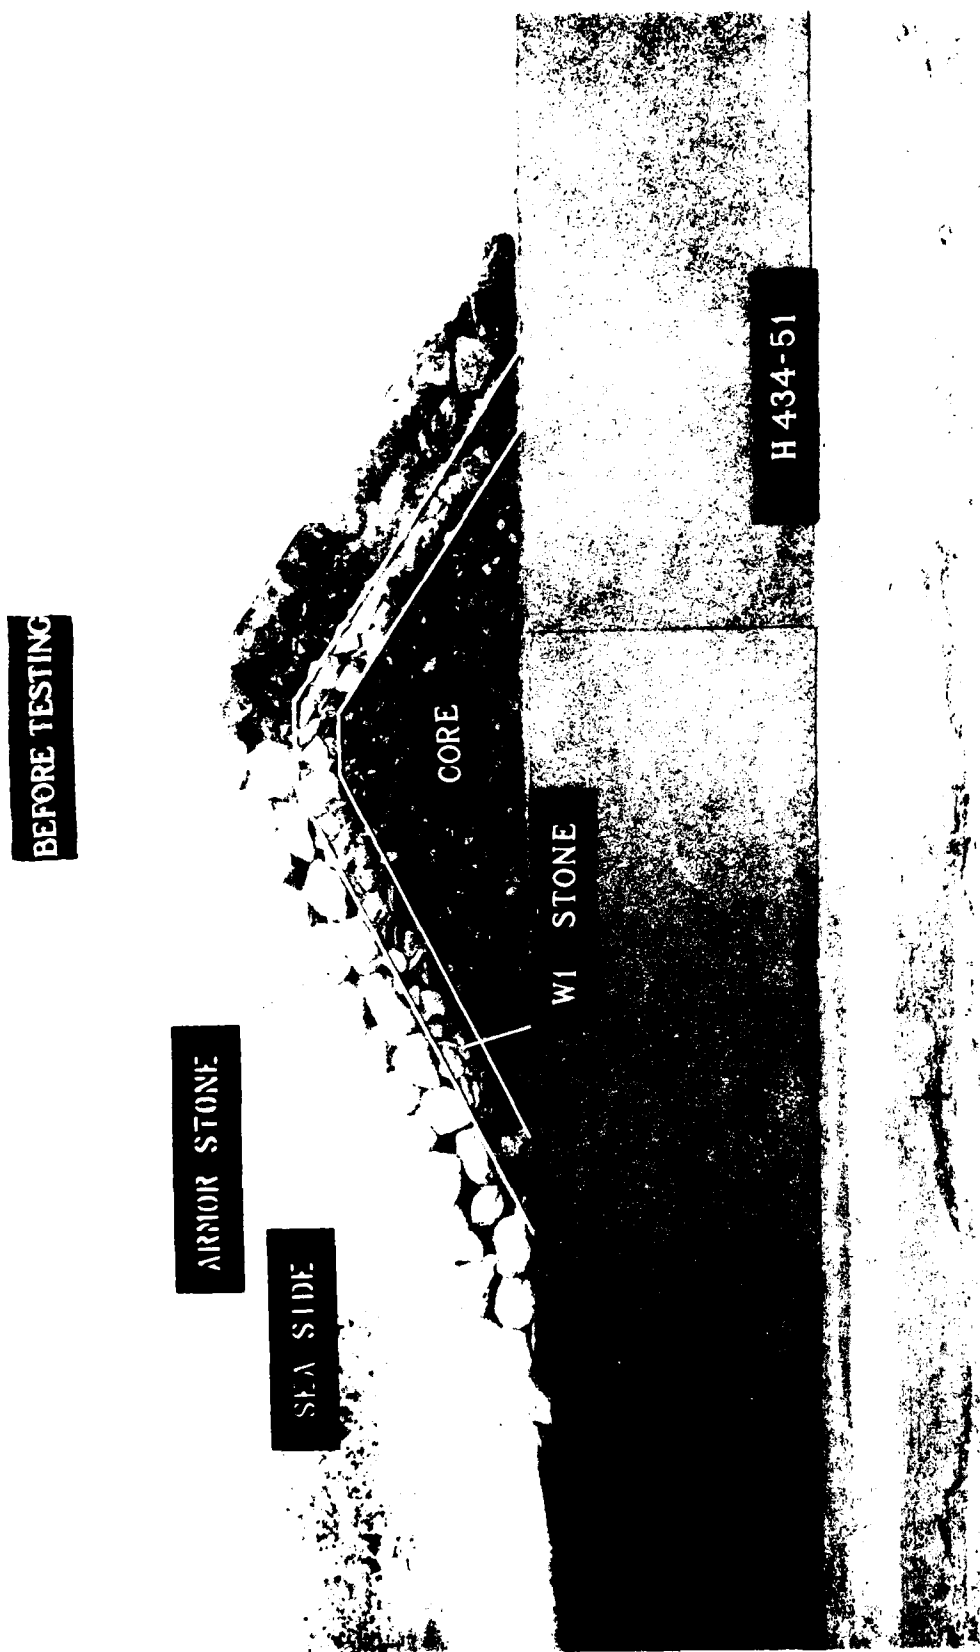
End view of a typical stone section before wave attack at a 1V-on-2H sea-side structure slope;  $W_a = 0.55 \text{ lb}$
